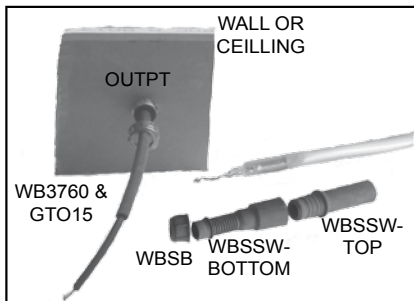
Slide the metallic bushing over the GTO cable and WB3760 assembly
